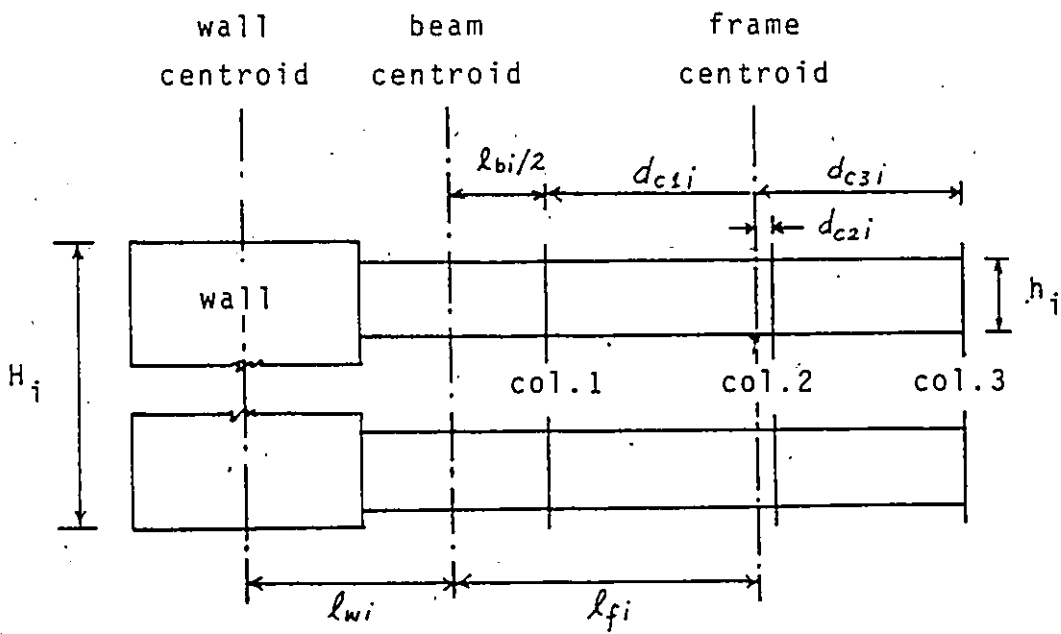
ELEVATION OF TYPICAL SEGMENT (SEGMENT  $i$ )
